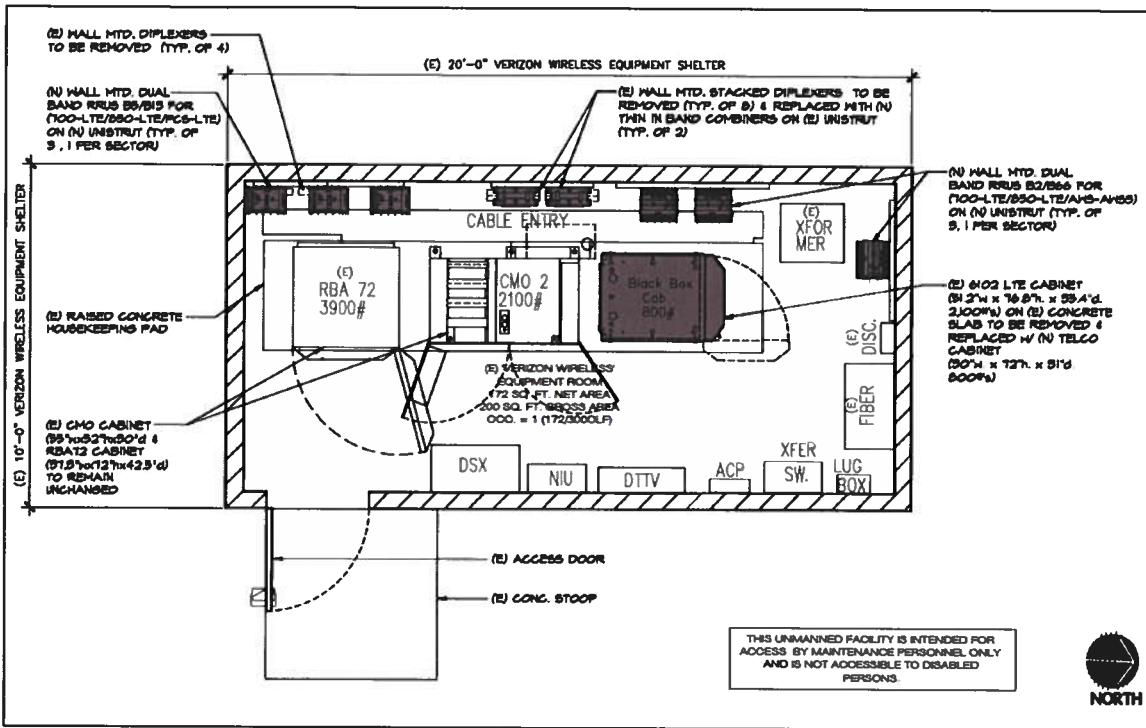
Proposed Equipment Shelter (Source: Plans dated 01/23/19).
